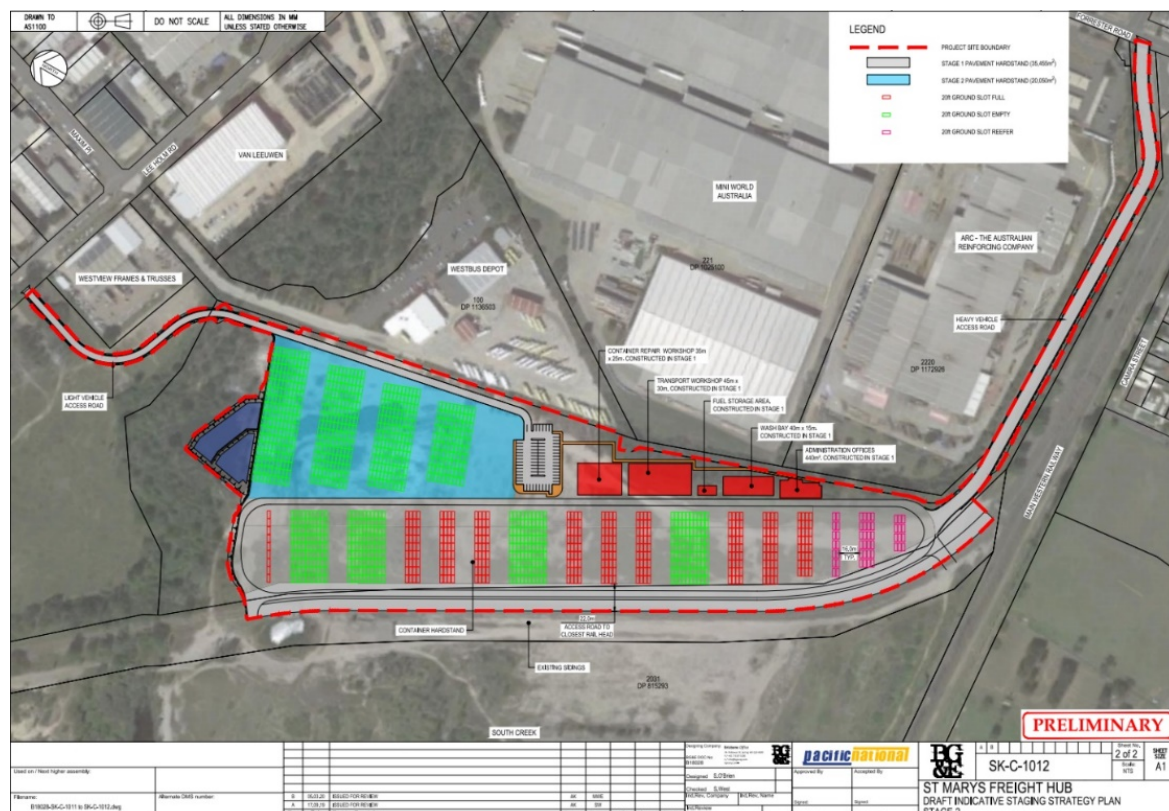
| Construction Staging Plan – Stage 2 (Source: Applicant's Preliminary Construction Staging Strategy)
